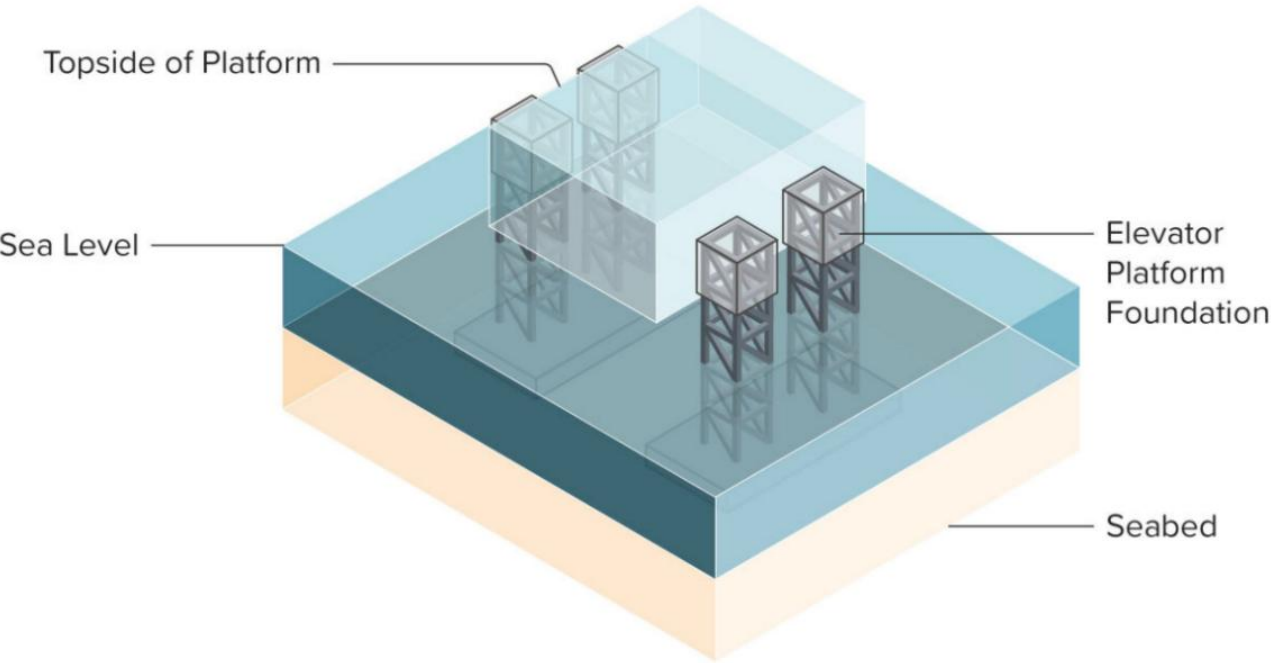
Indicative Arup Concept Elevating Platform Foundation Schematic
